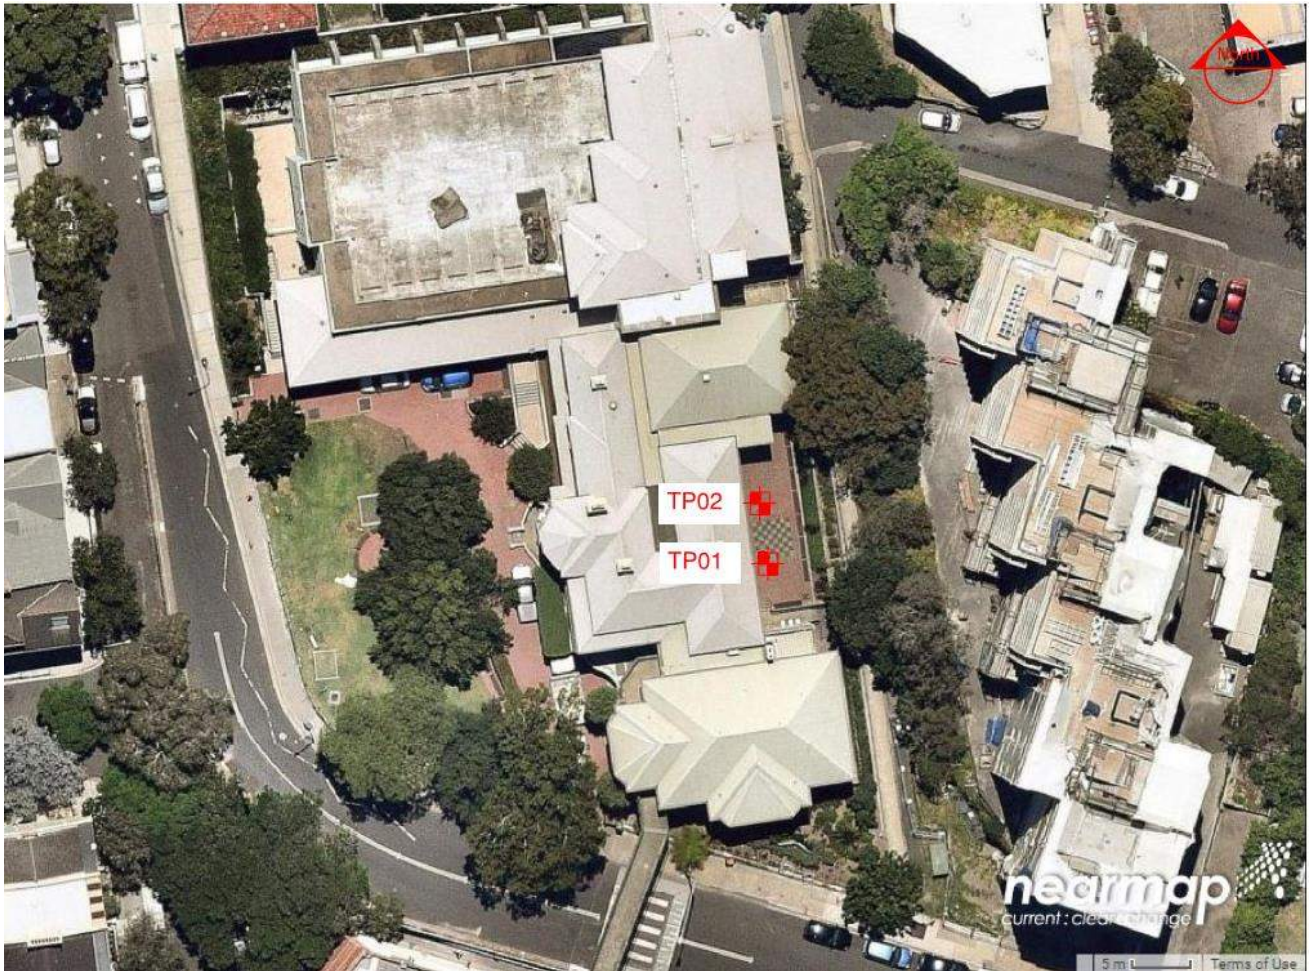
Senior School Site and trial pit locations (Source Nearmap)
